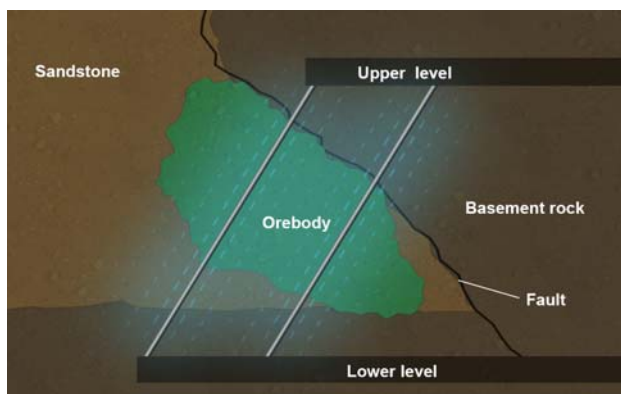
Vertical section view through orebody showing two inclined ground freezing pipes (McArthur River Operation, 2010)
